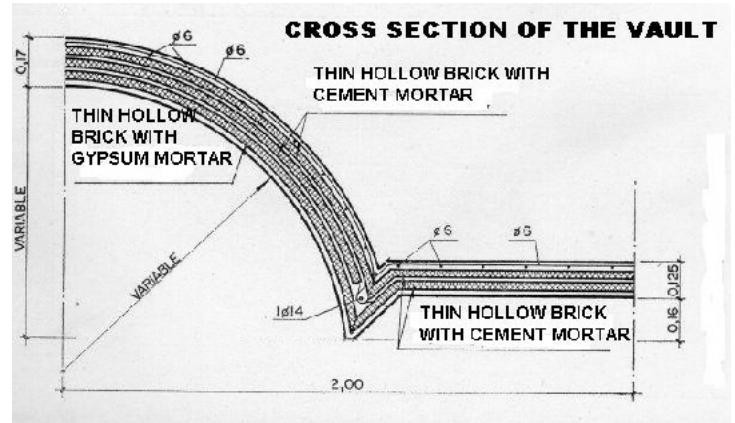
Detail of one of the chapels of the former church composed of brick masonry and reinforcement bars.
